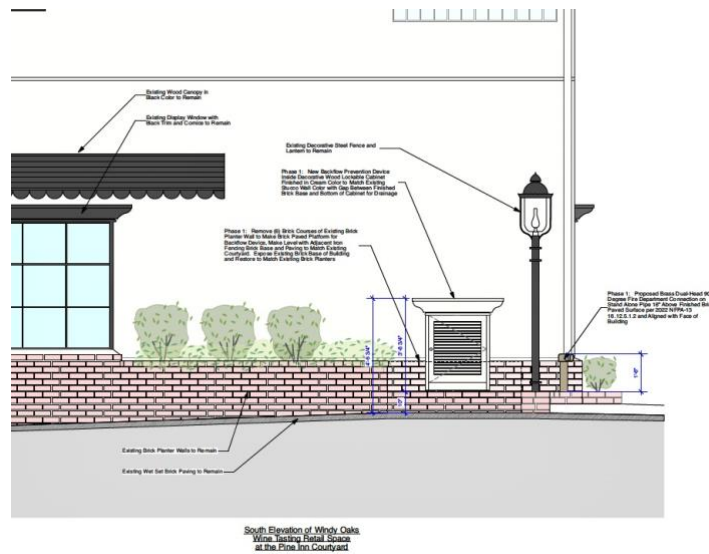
Detail of the proposed riser box and brass riser head, taken from Sheet 3 of the Design Drawings by Dyar Architecture.
